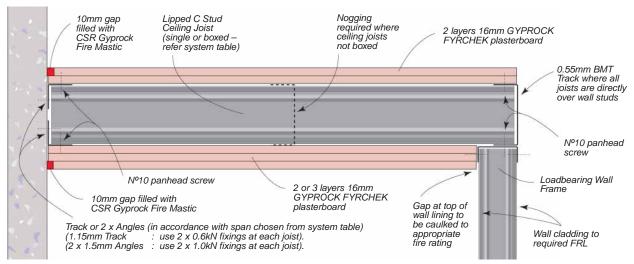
GENERAL LAYOUT OF C-H STUD CEILING FRAMING LINED TWO SIDES
